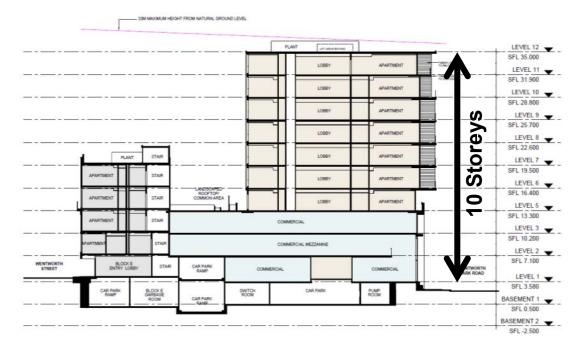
South elevation demonstrating reduced street wall along a large portion of the Wentworth Street frontage.
